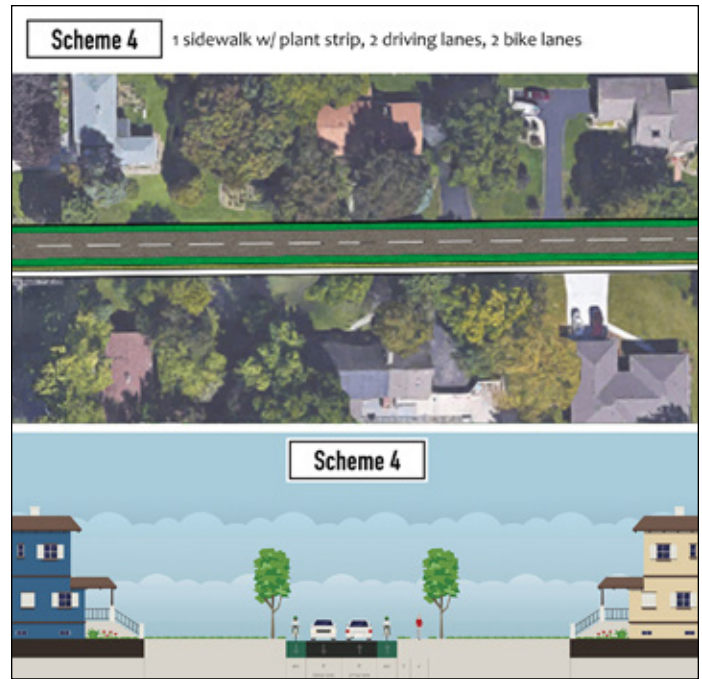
Scheme 4 for the reconstruction of Greenway Road.
